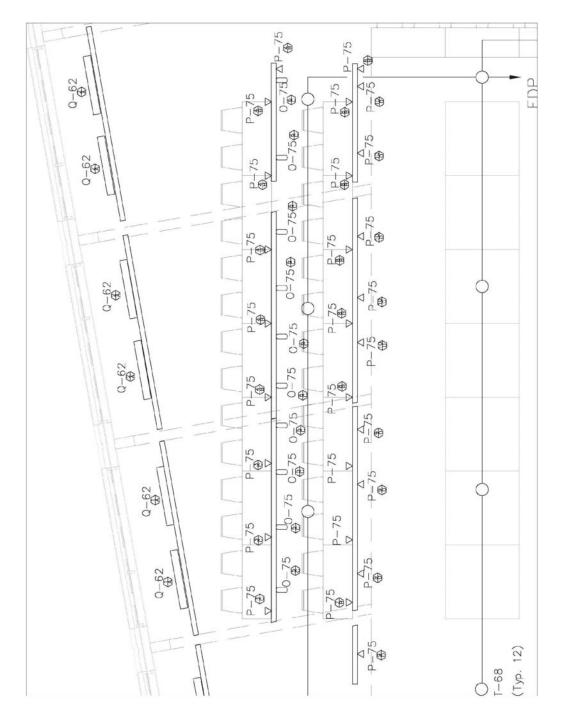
Showroom – Lighting Plan Rows 1 and 2
